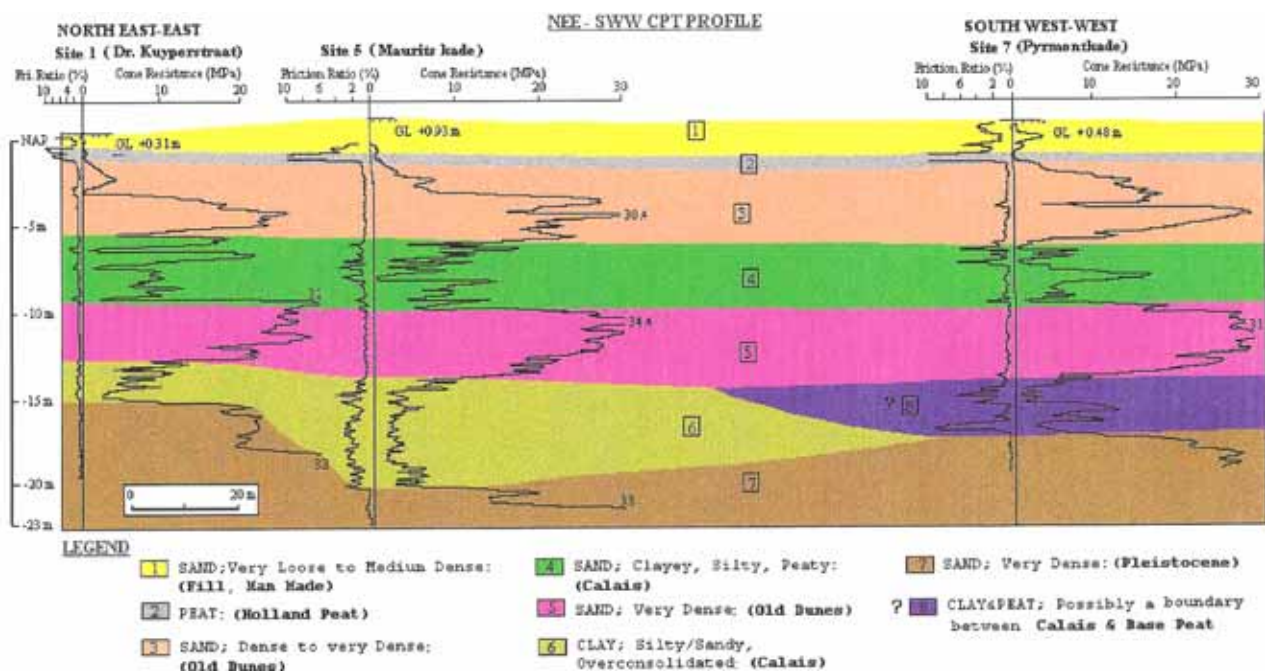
Geotechnical profile A4, connecting CPT's 1, 5 and 7 (Dr. Kuyperstraat/Mauritskade to Waldeck Pyramontkade) (Kambole, 1998)
